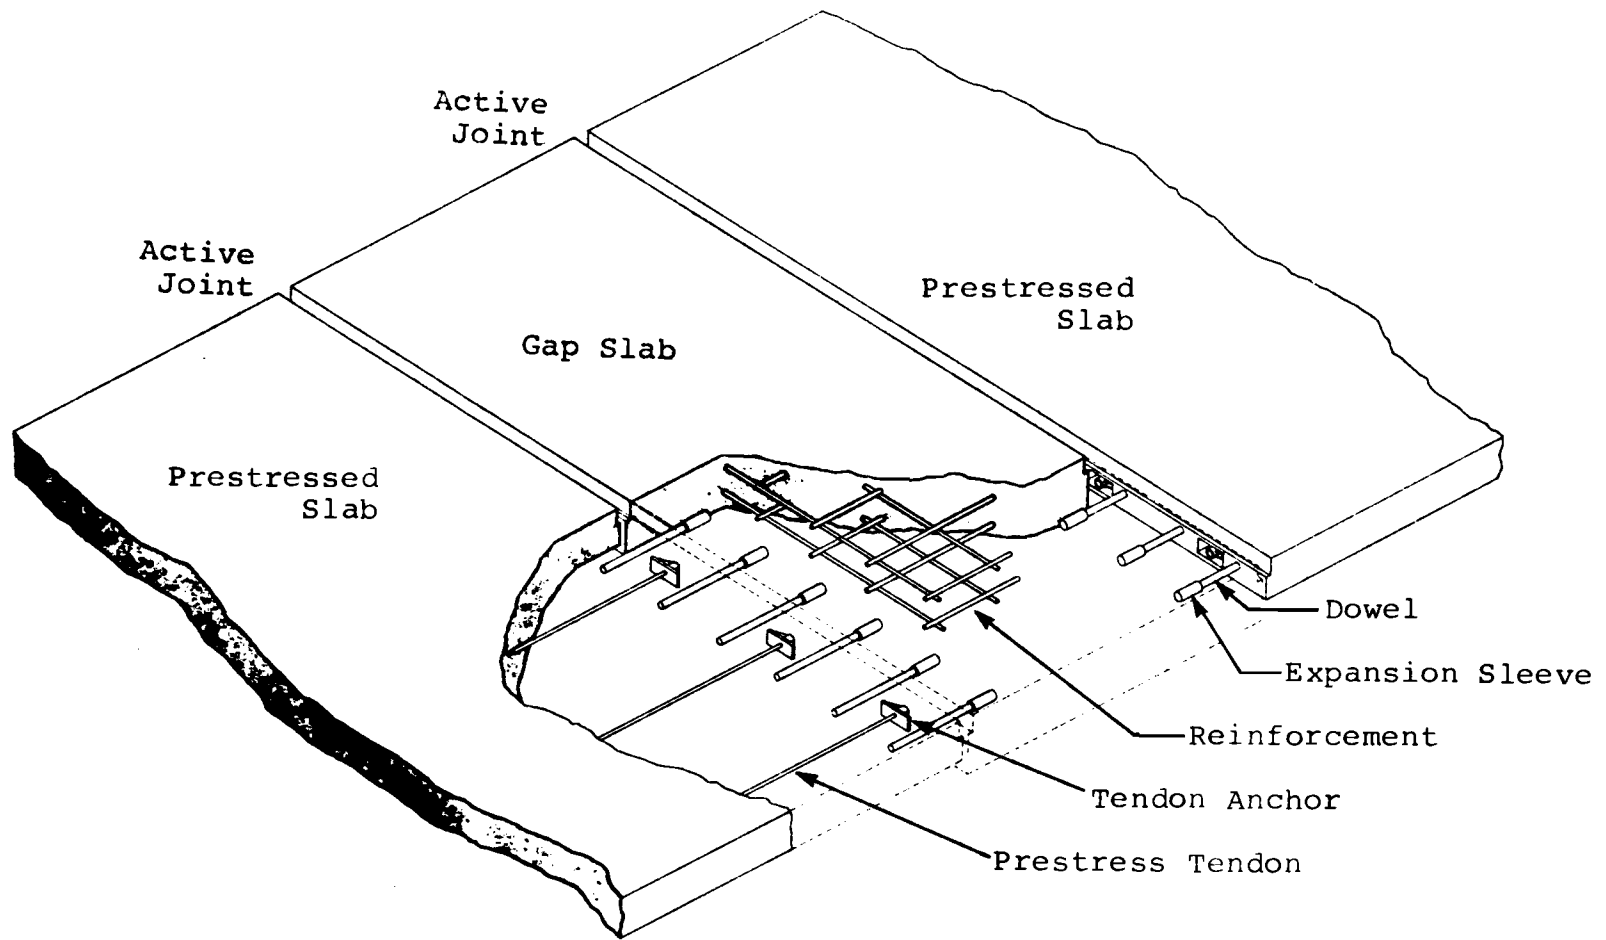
Typical detail of gap slab between prestressed slabs (Ref 92).
